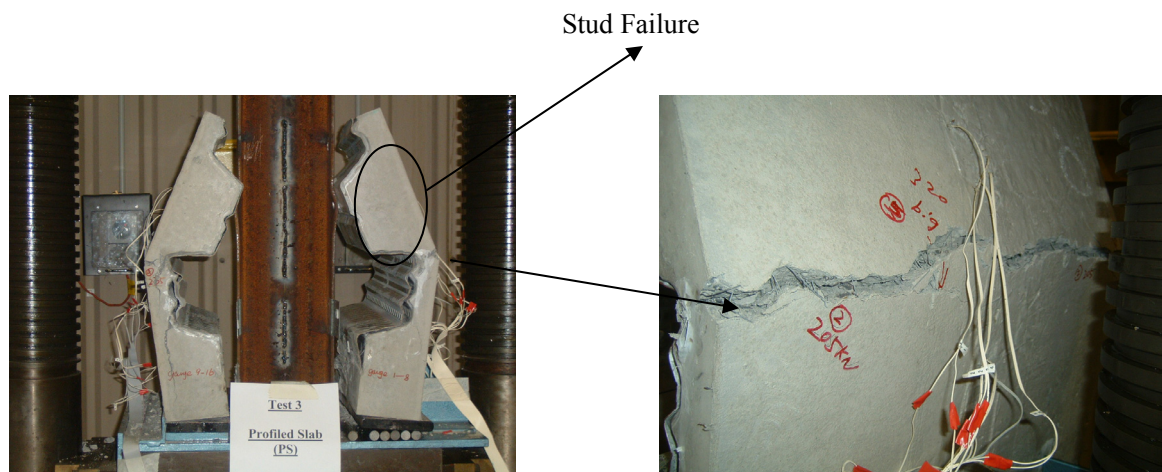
Stud Failure and Concrete Failure for Concrete with $F=0.6$ Fibres
